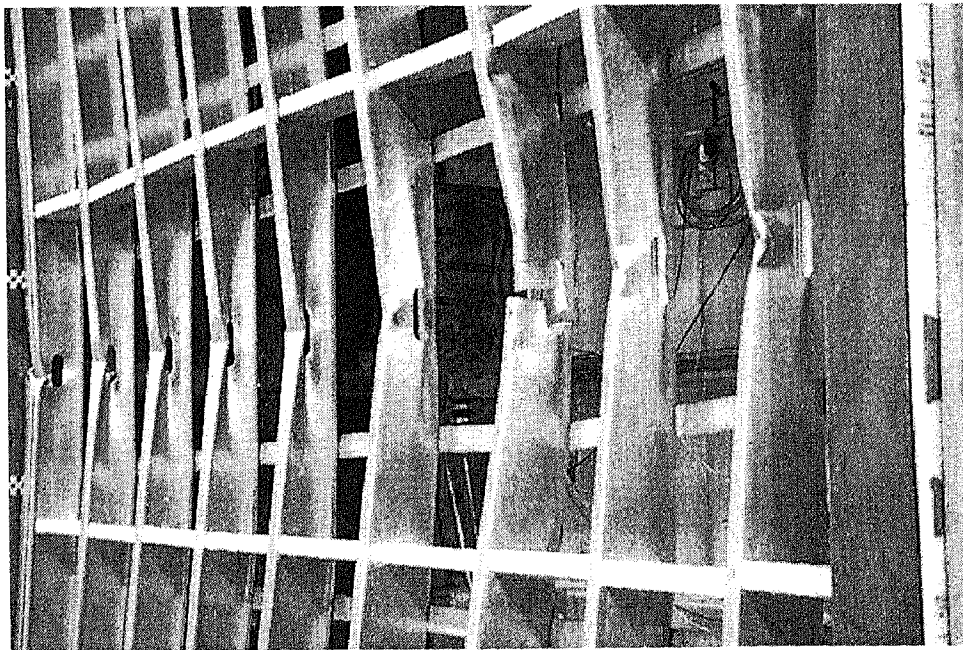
Test M1c Post-Test Failure at Utility Hole
